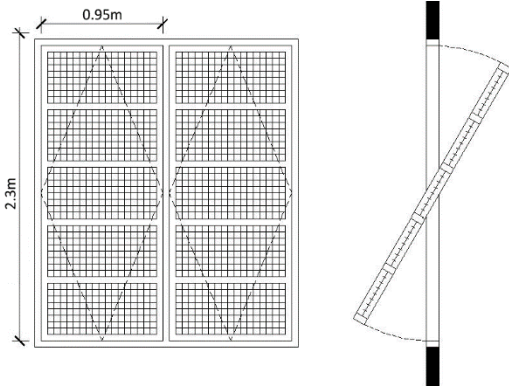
Elevation and section of typical capiz window found in Gabaldon Schoolhouses
